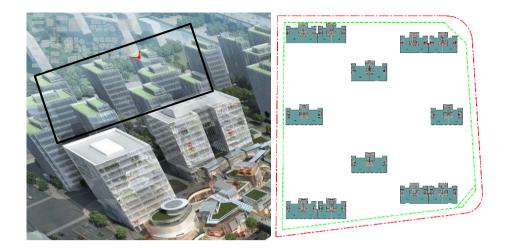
(a) The sketch and (b) plan of the office building in Shanghai Hongqiao.
